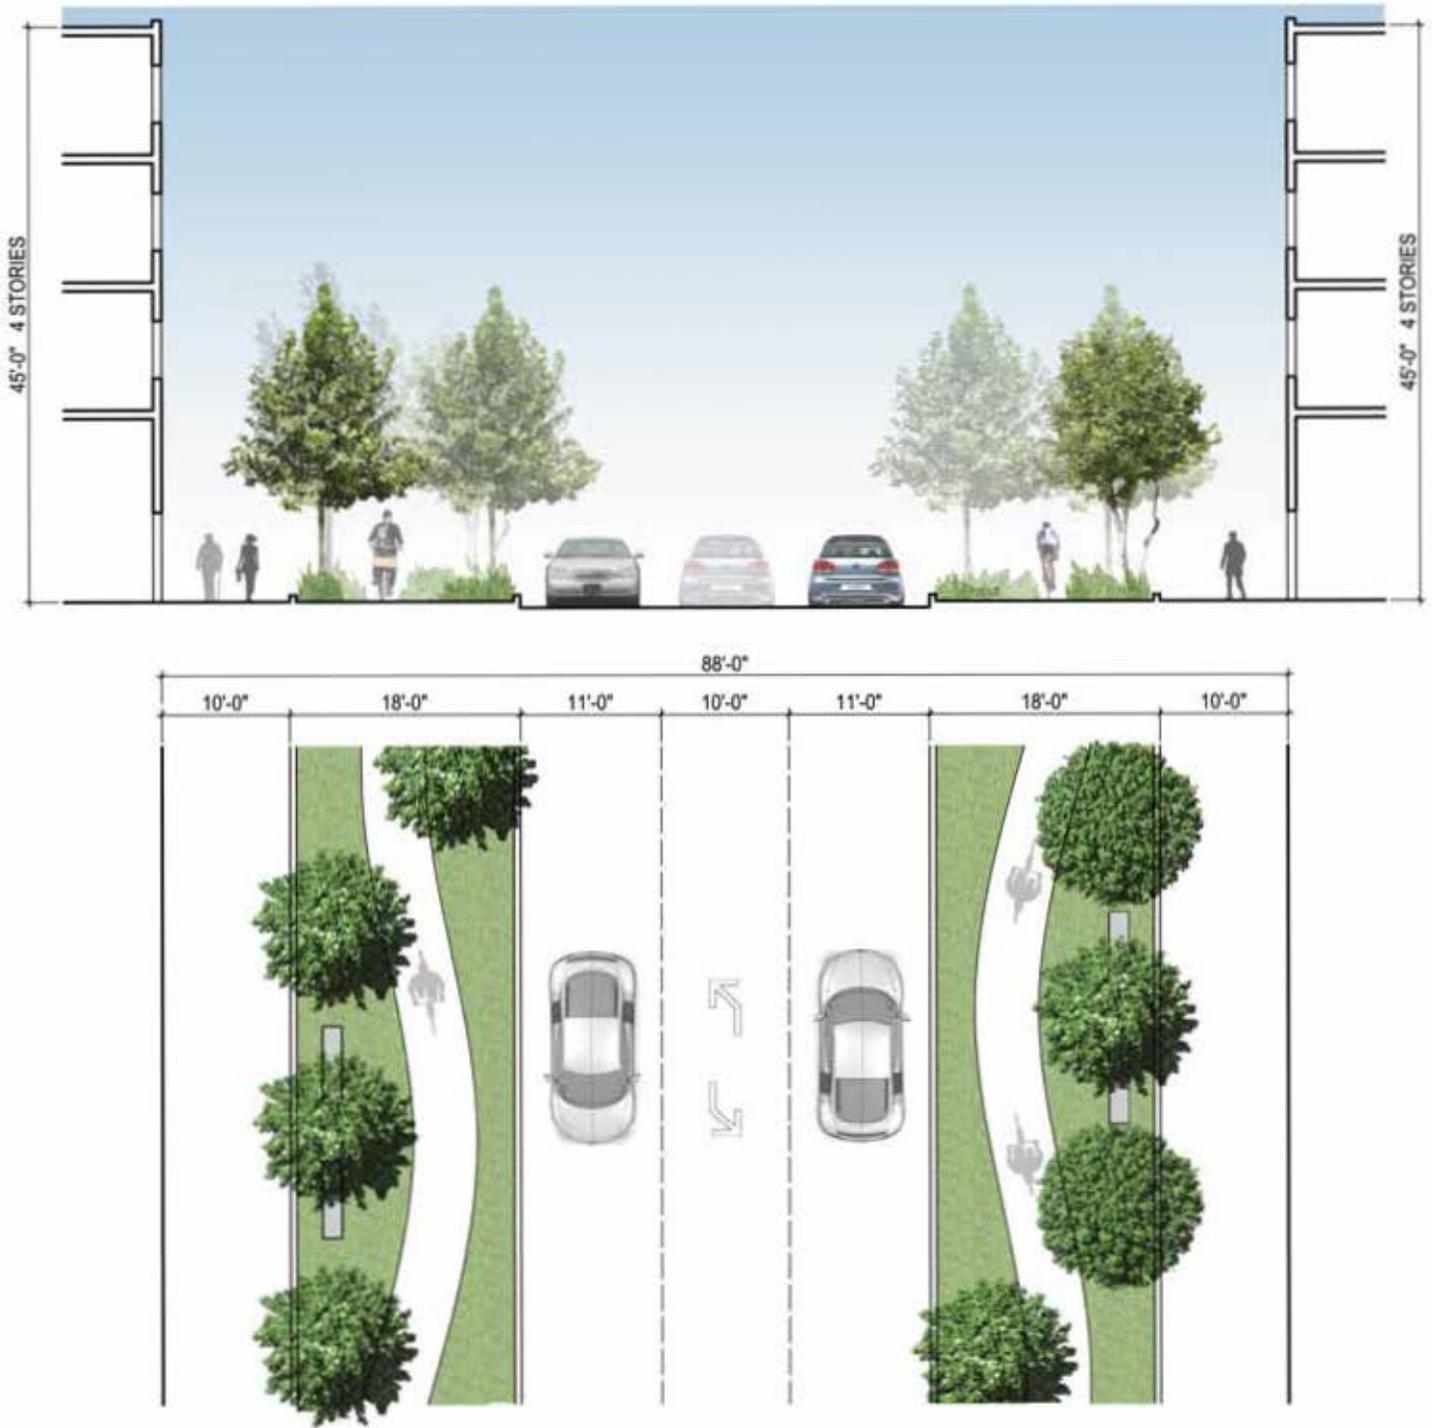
Street Plan and Section - Hallock Ave. to Rt 347 with bicycle lane in planting strip
